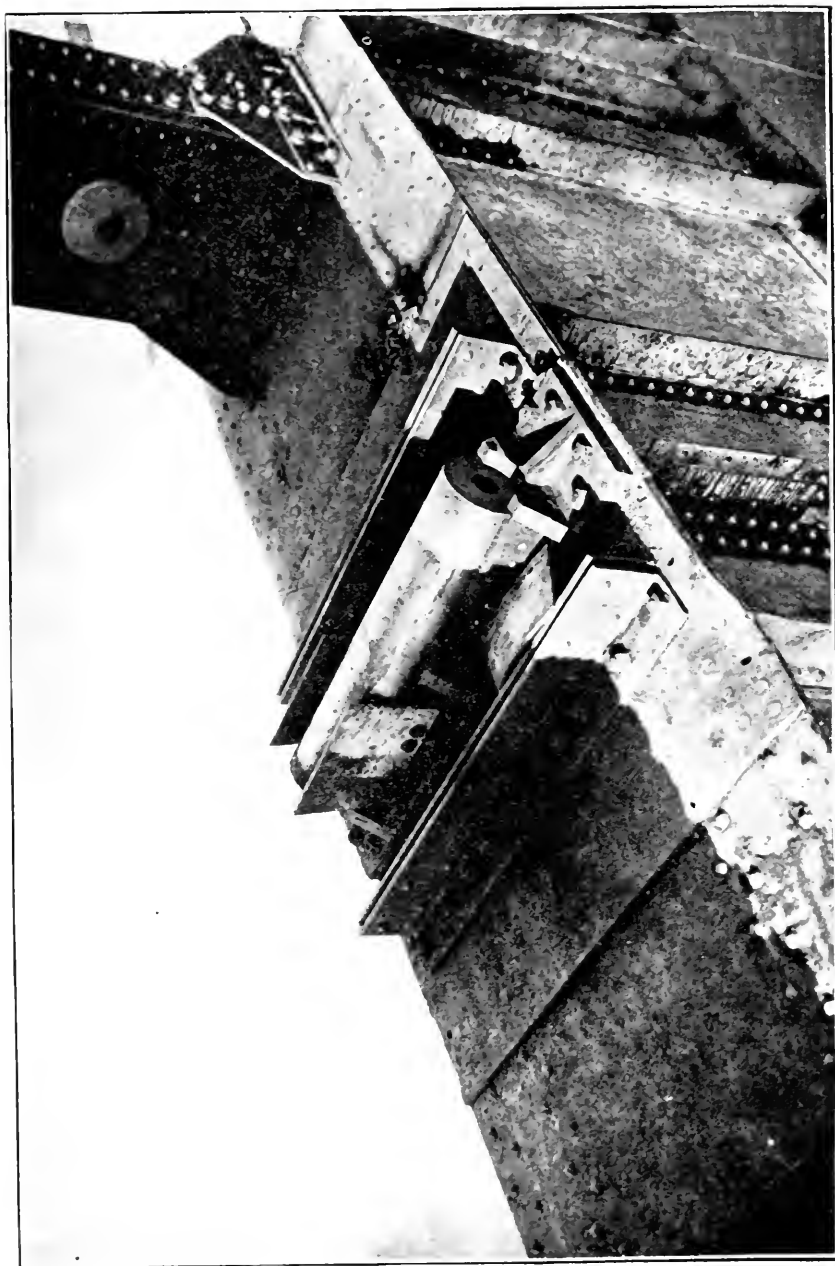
Photograph showing the girder at the N.W. corner after the accident.
